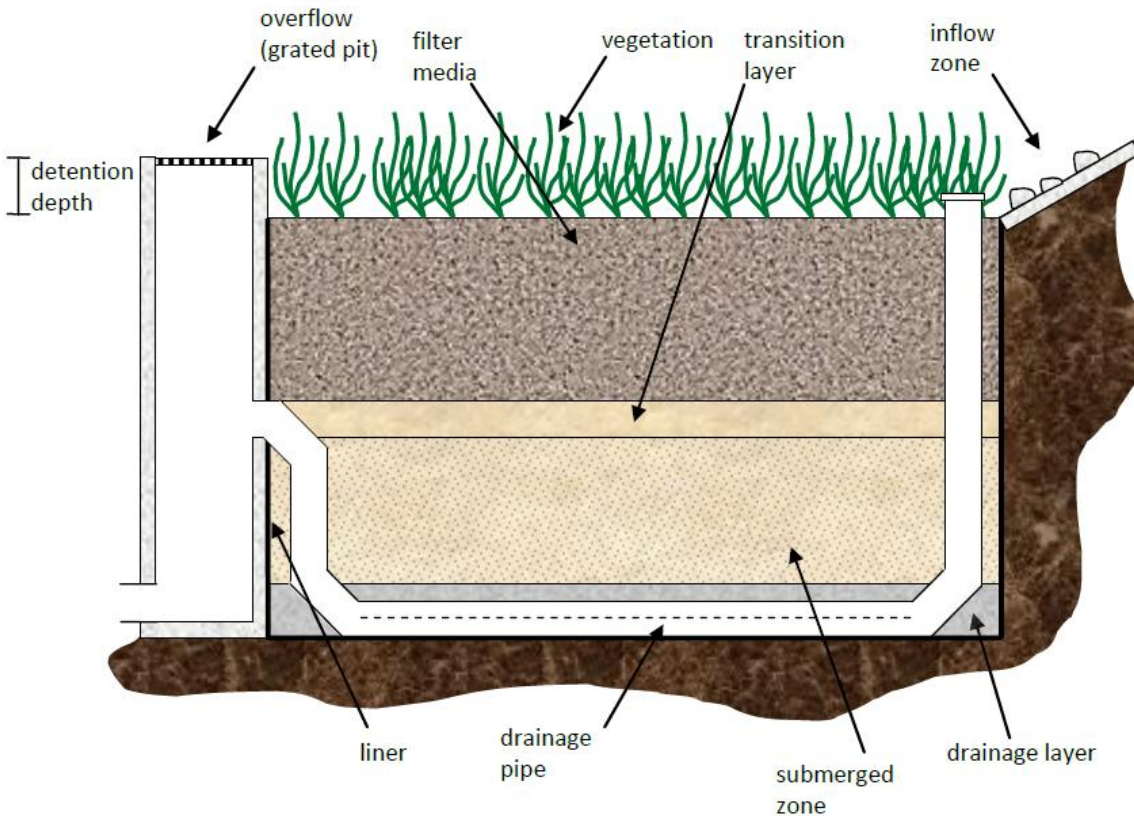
Bioretention system cross section (length). FAWB (2009)
